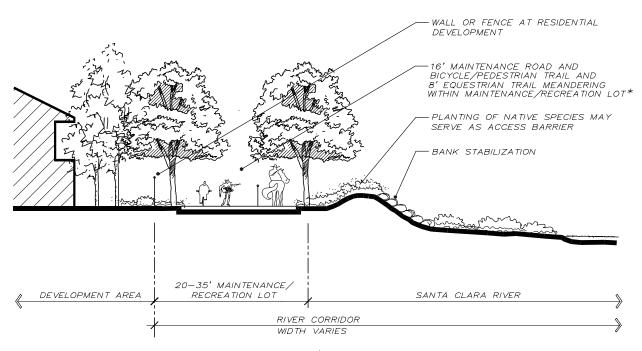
MASTER TRAILS PLAN
